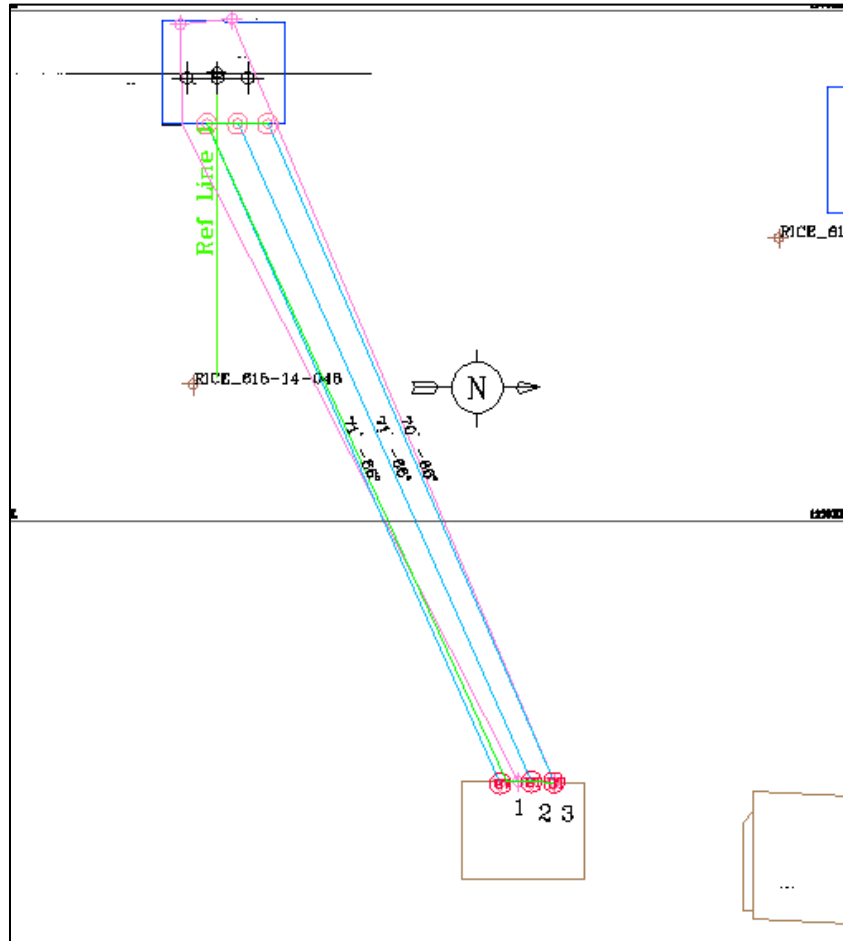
True North Gold Mine Typical Long-hole Drill Section
